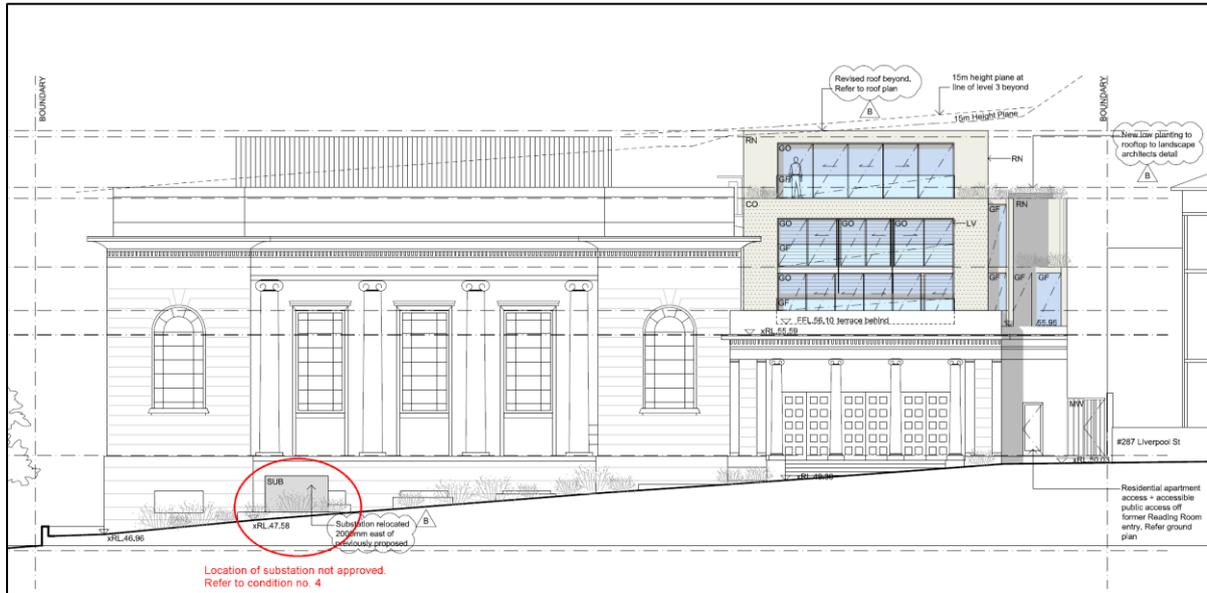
Excerpt of plans from the development approved under D/2014/1164 showing the approved Liverpool Street elevation.
